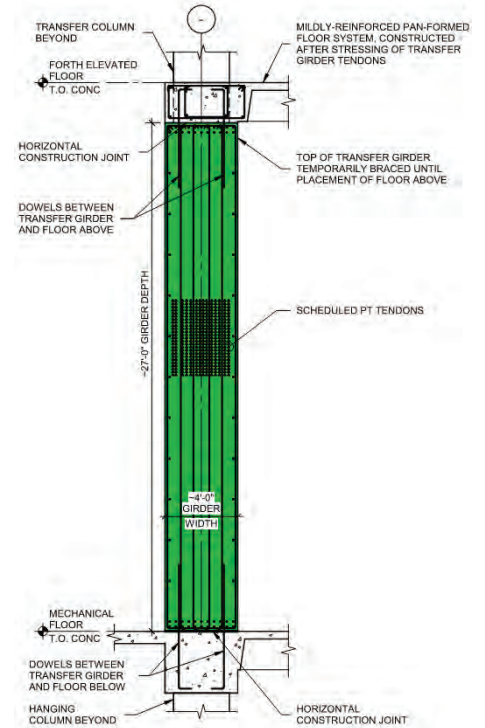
The cantilevering transfer girder is sandwiched between two floor plates.
